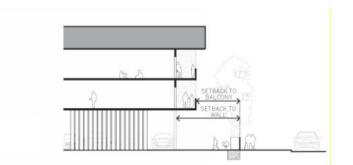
front boundary setback to balcony and wall
